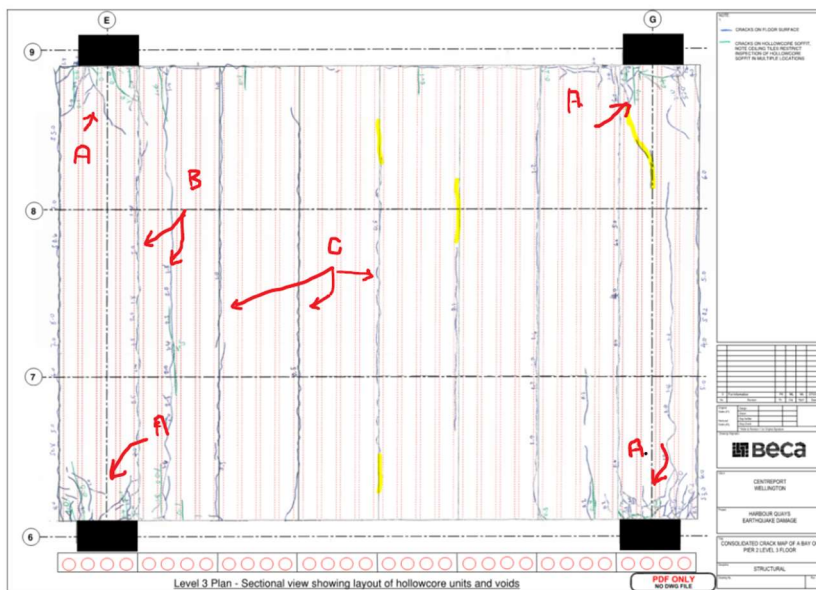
Beam elongation forming a large number of cracks at the beam to column junctions (A), longitudinal cracks in the topping and units below (B) and cracks in the topping where the sides of the units meet (C).³
